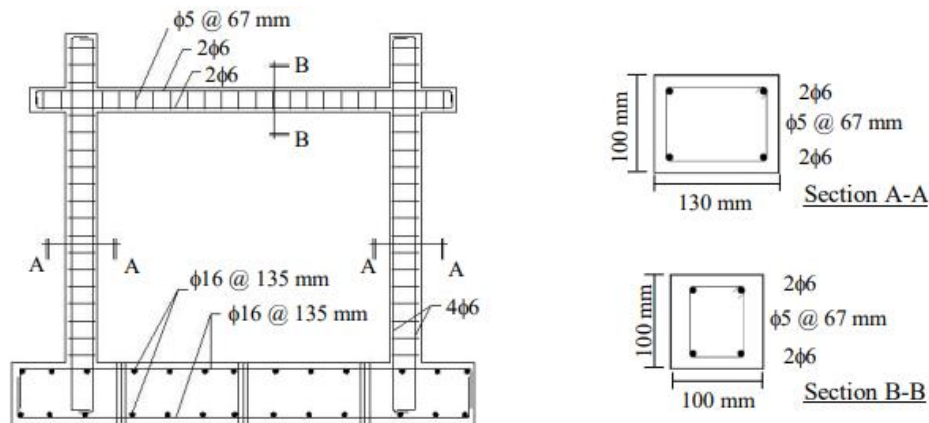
Reinforcement details of bearing walls BW3 and BW4
